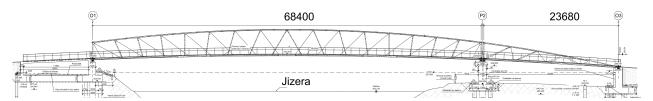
A longitudinal section of the investigated footbridge structure [10].
